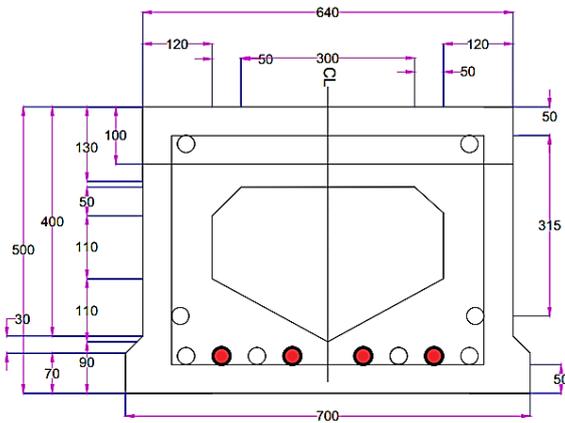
Cross section properties of BS12 girder. (Debonded strands)
